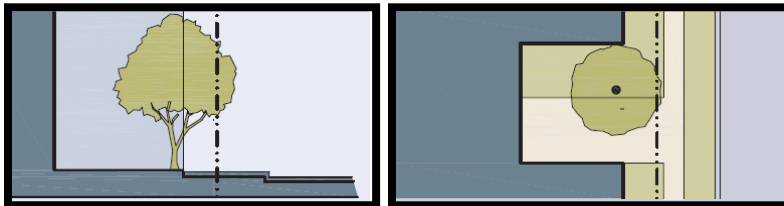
D. SHOPFRONT BUILDING FRONTAGE.
